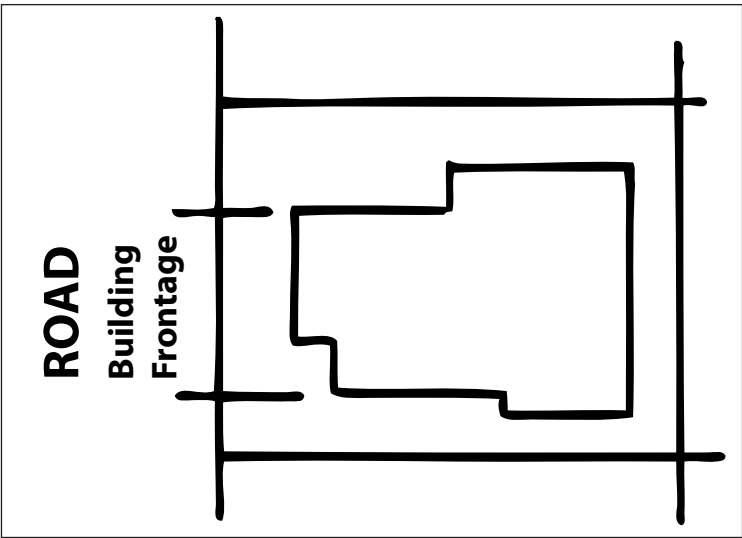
Building Frontage for Calculation of Extent of Signage
